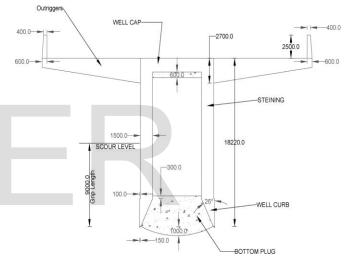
Sectional elevation of well foundation at section X-X (all dimensions are in mm)
